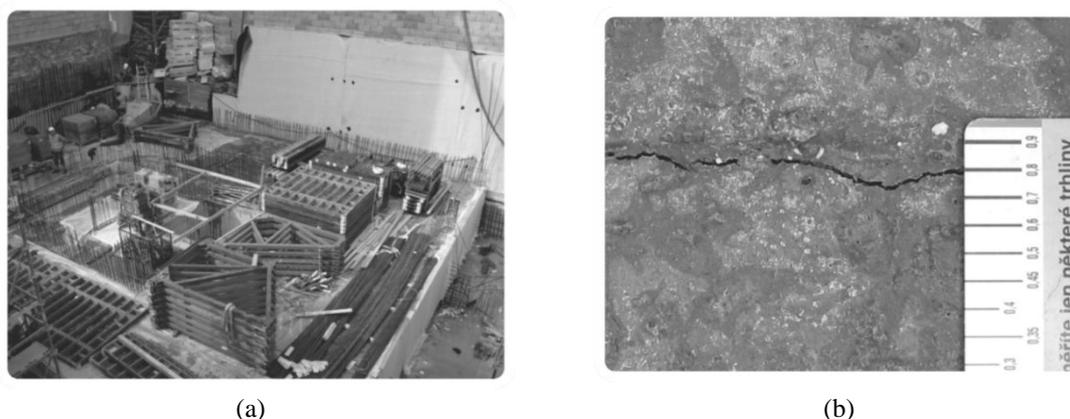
Foundation block of a residential building in Prague, Czech Republic: (a) overall view of the construction side and (b) detail of  $\sim 0.8$  mm crack width caused by concrete shrinkage
